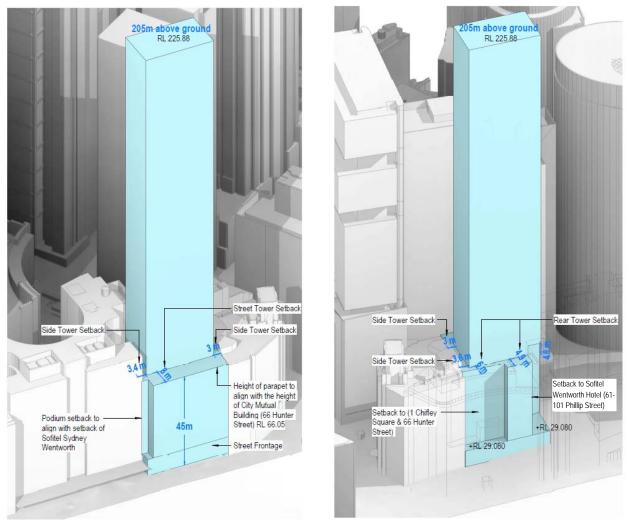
X Indicative Building Envelope Massing (Bligh Street frontage and rear)
